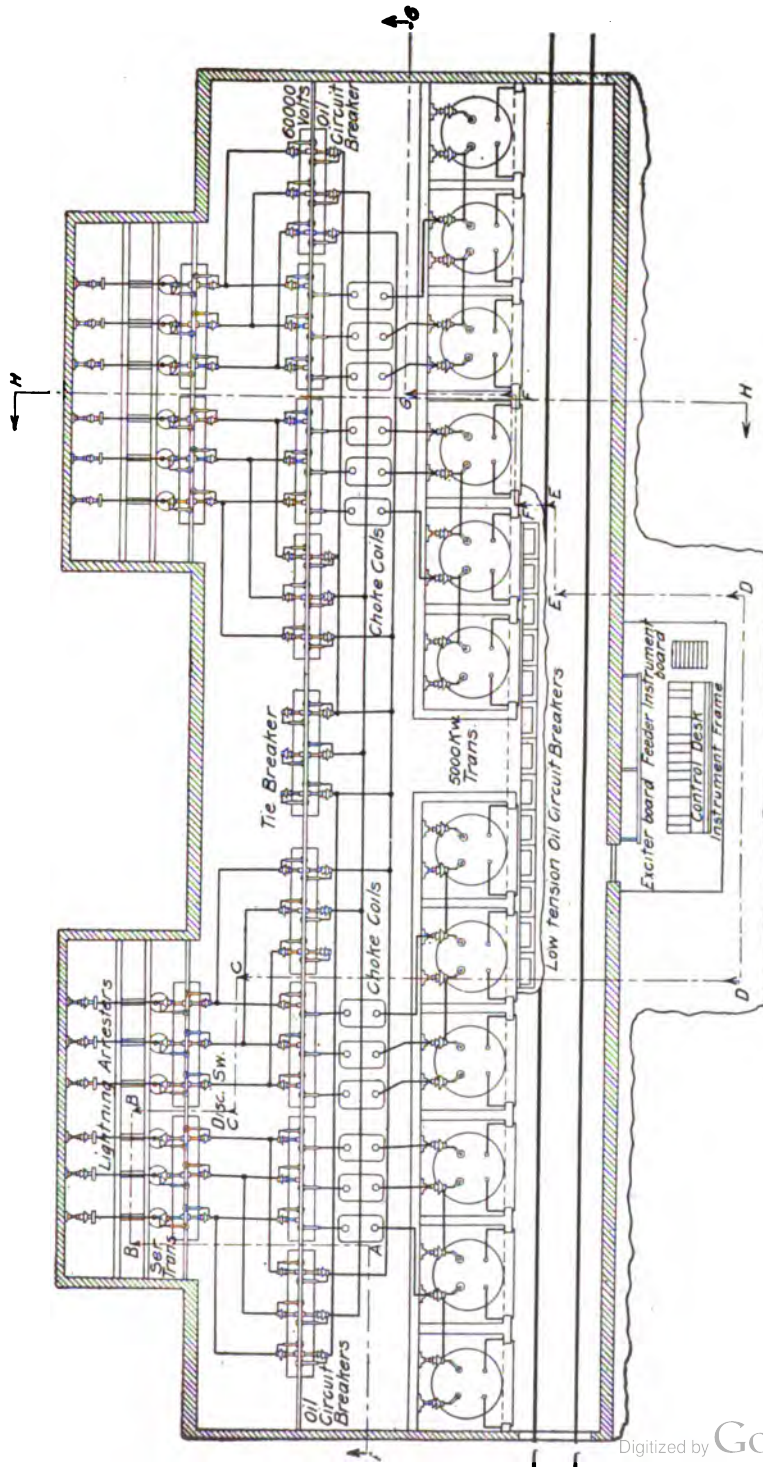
60,000-Volt Station : Plan View of Switching Arrangement.
